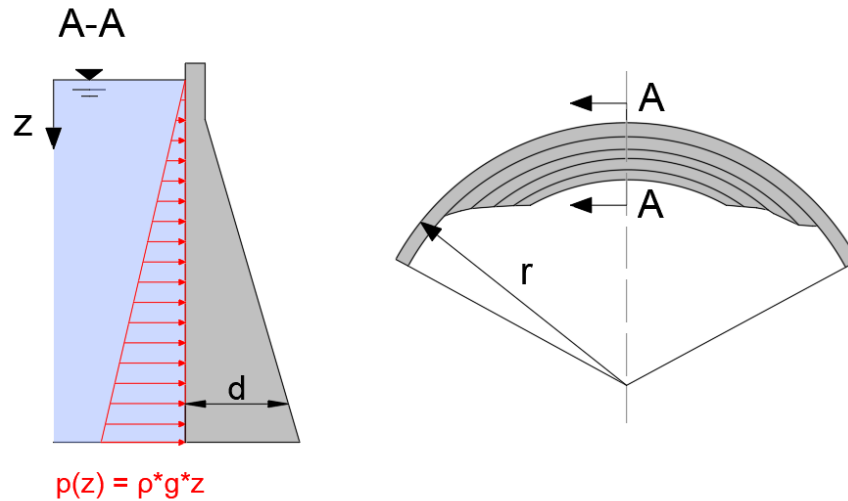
Constant-radius arch dam - layout and cross section, cf. [3]
